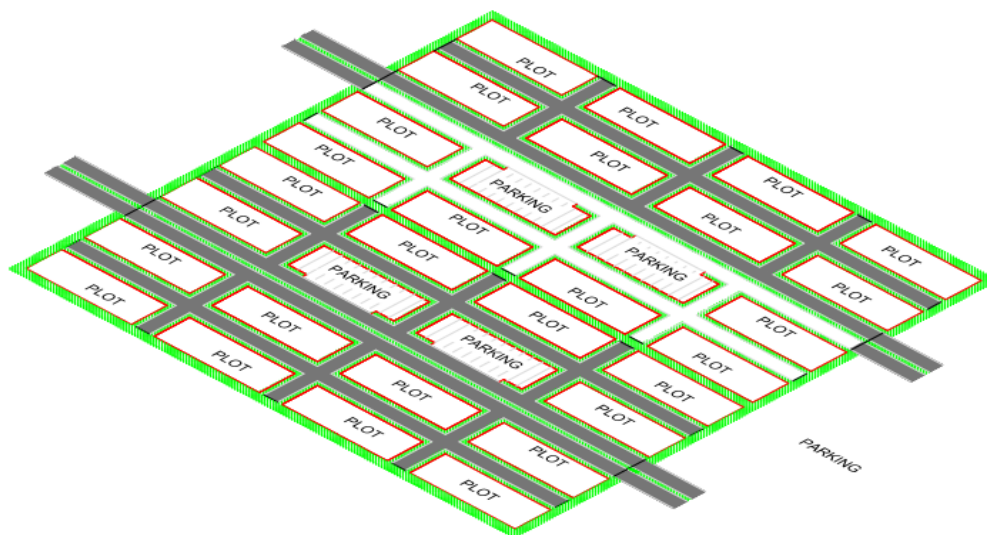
(c): The site layout plan at Ghanga Patna, in Bhubaneswar (Resettlement colony)
